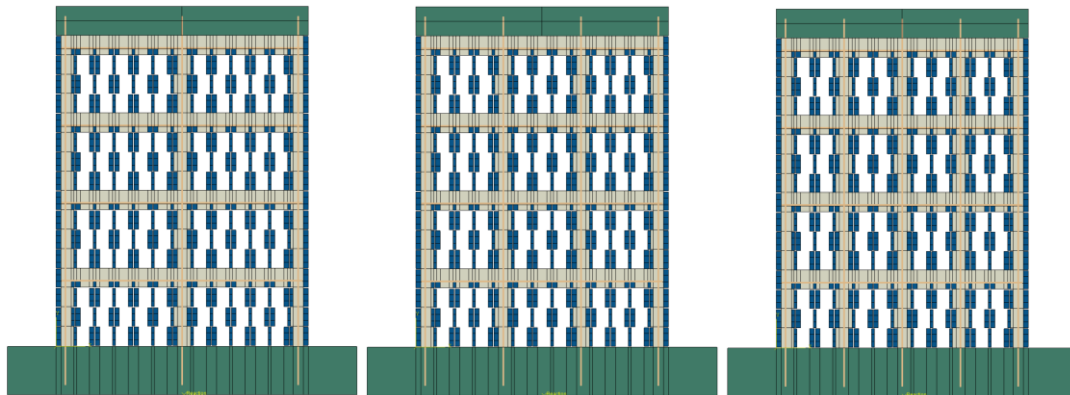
Grout Core Spacings (3.2 m Wall Height)
